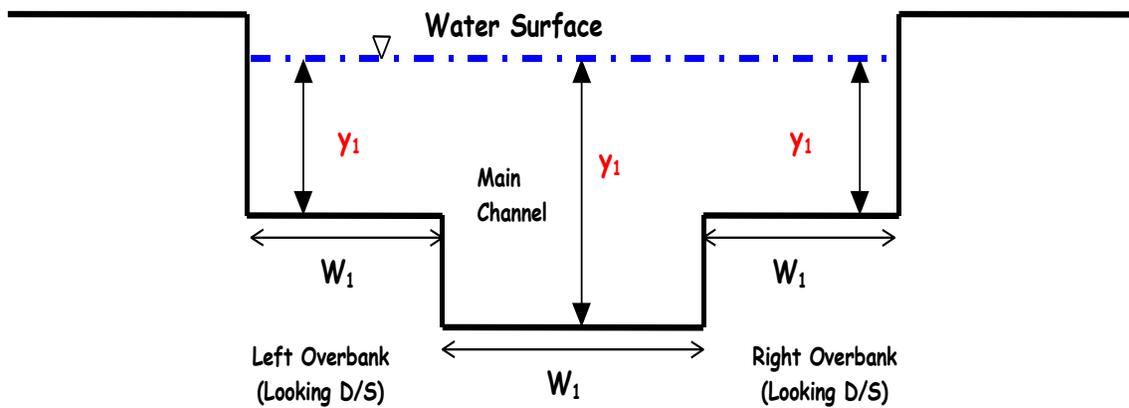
Definition sketch for the Approach Section (Looking Downstream)
